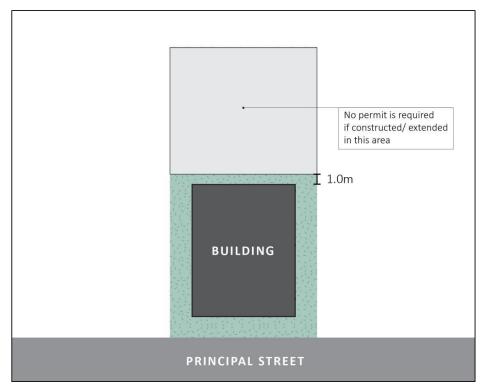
Construction or extension of an outbuilding is exempt if located in this area
